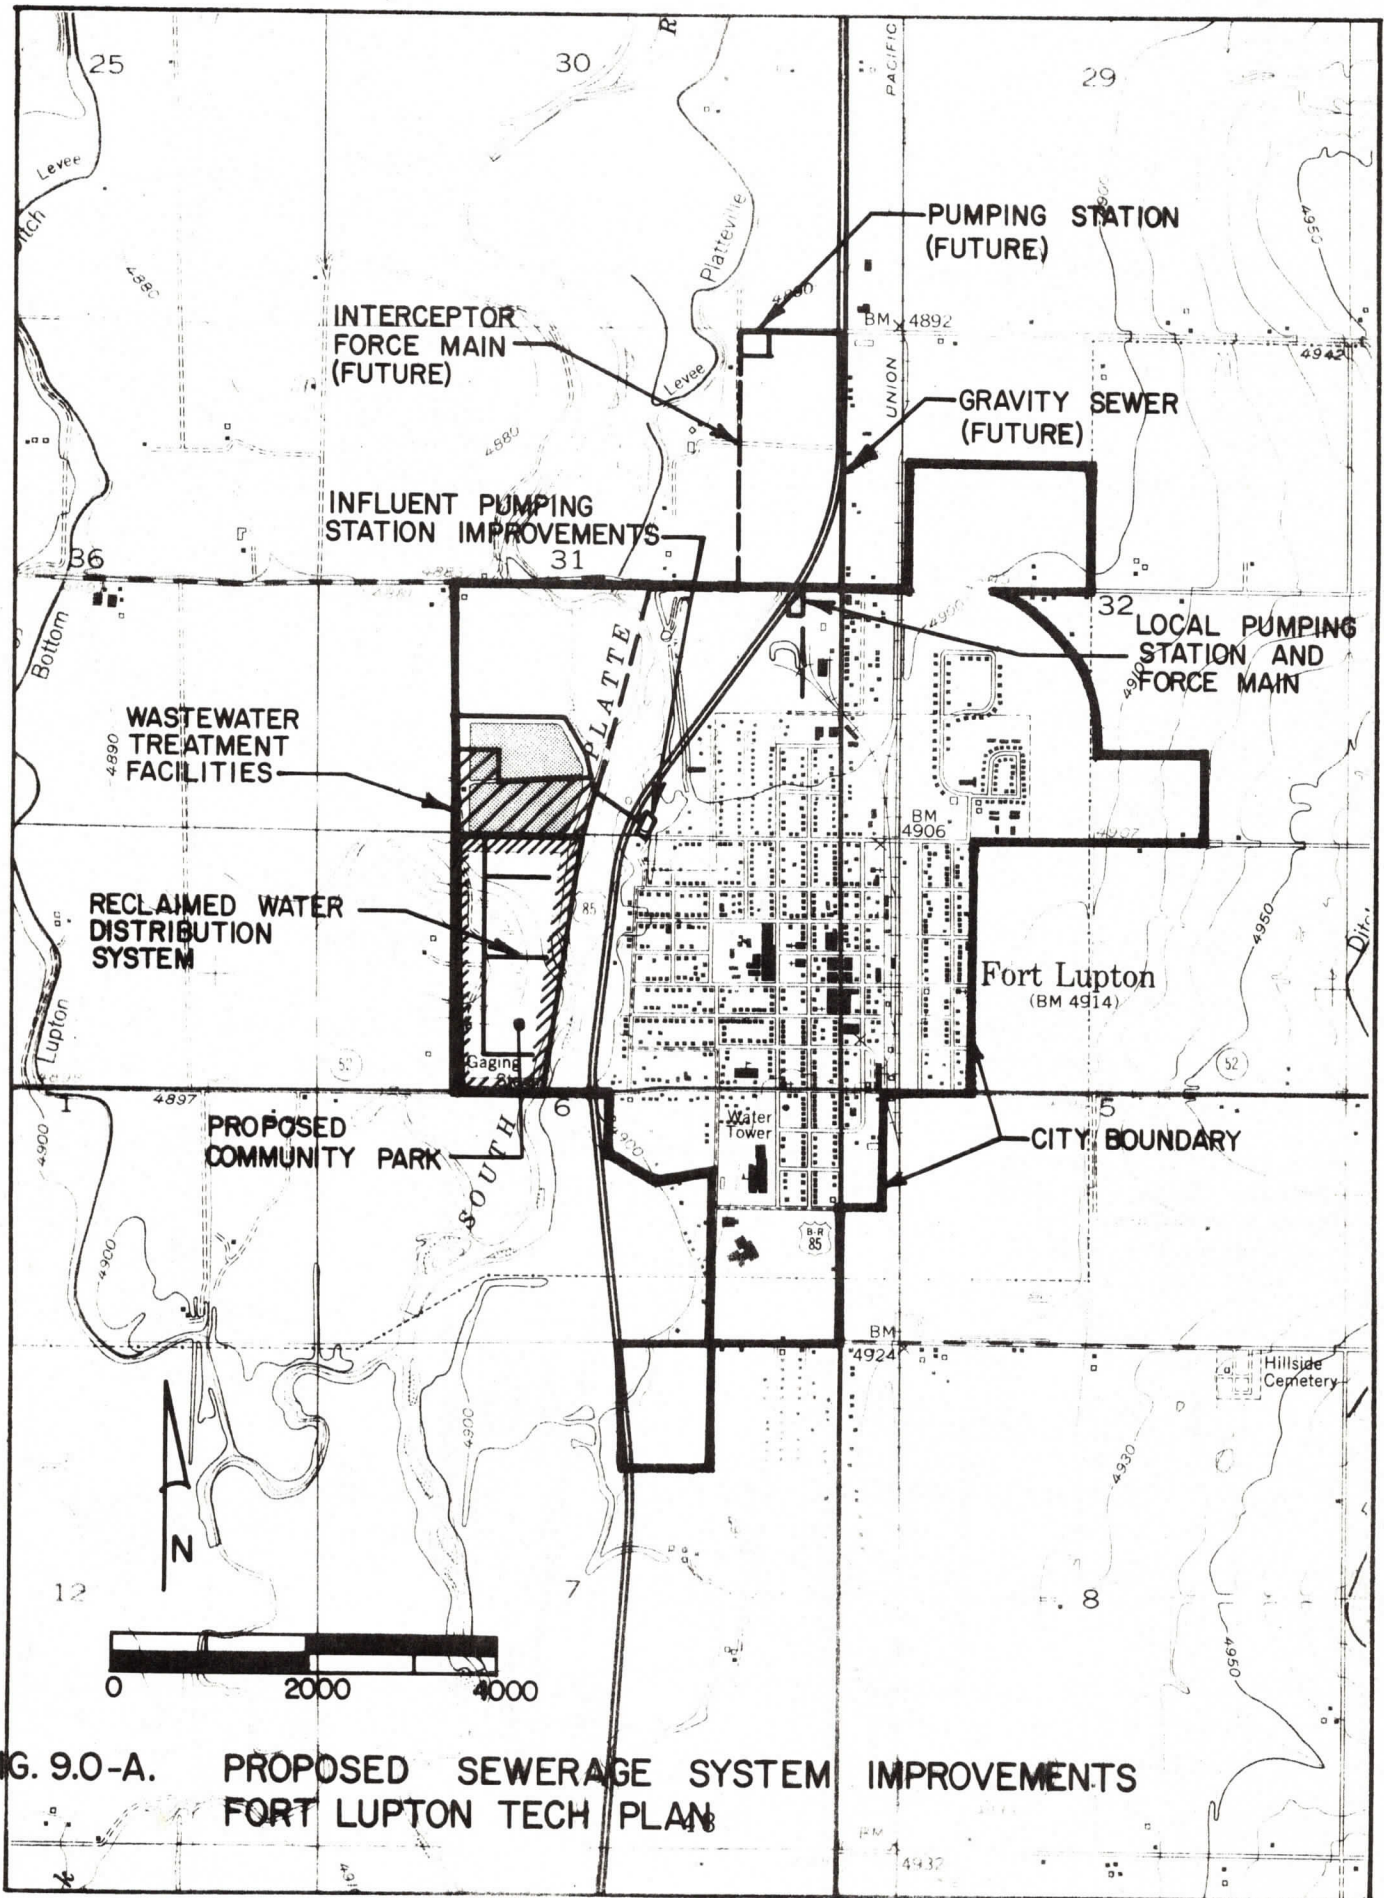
A. PROPOSED SEWERAGE SYSTEM IMPROVEMENTS FORT LUPTON TECH PLAN
